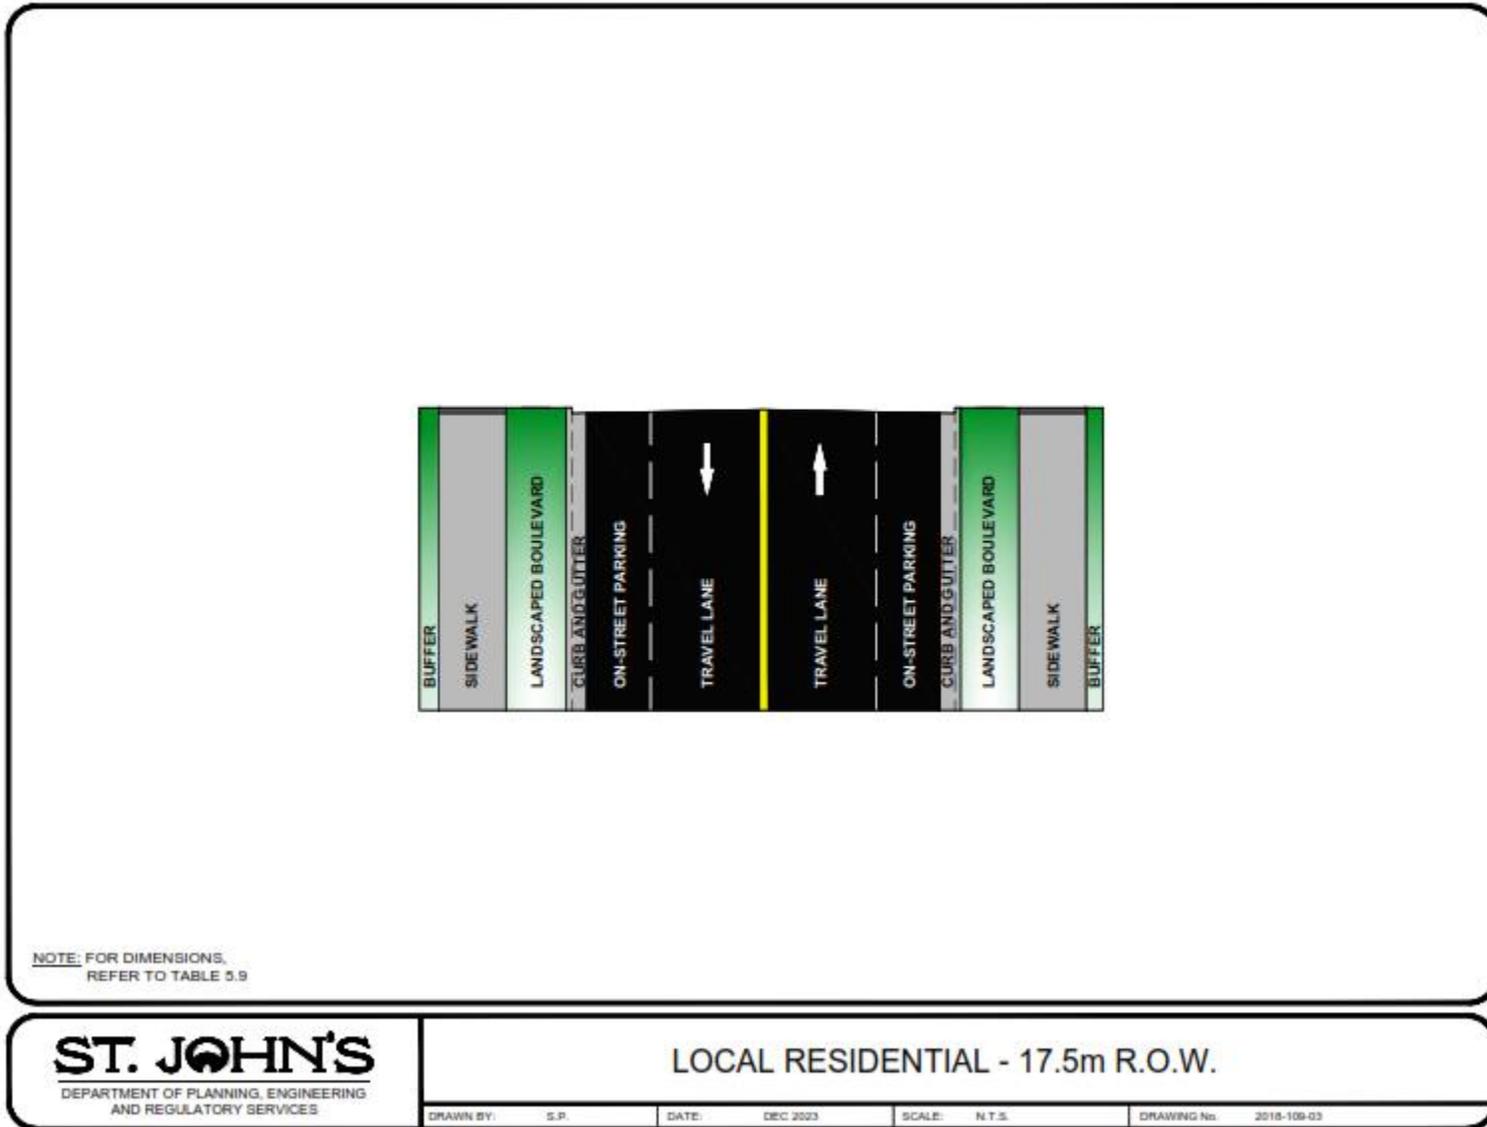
Local Cross-Section Elements (17.5m R.O.W.)
